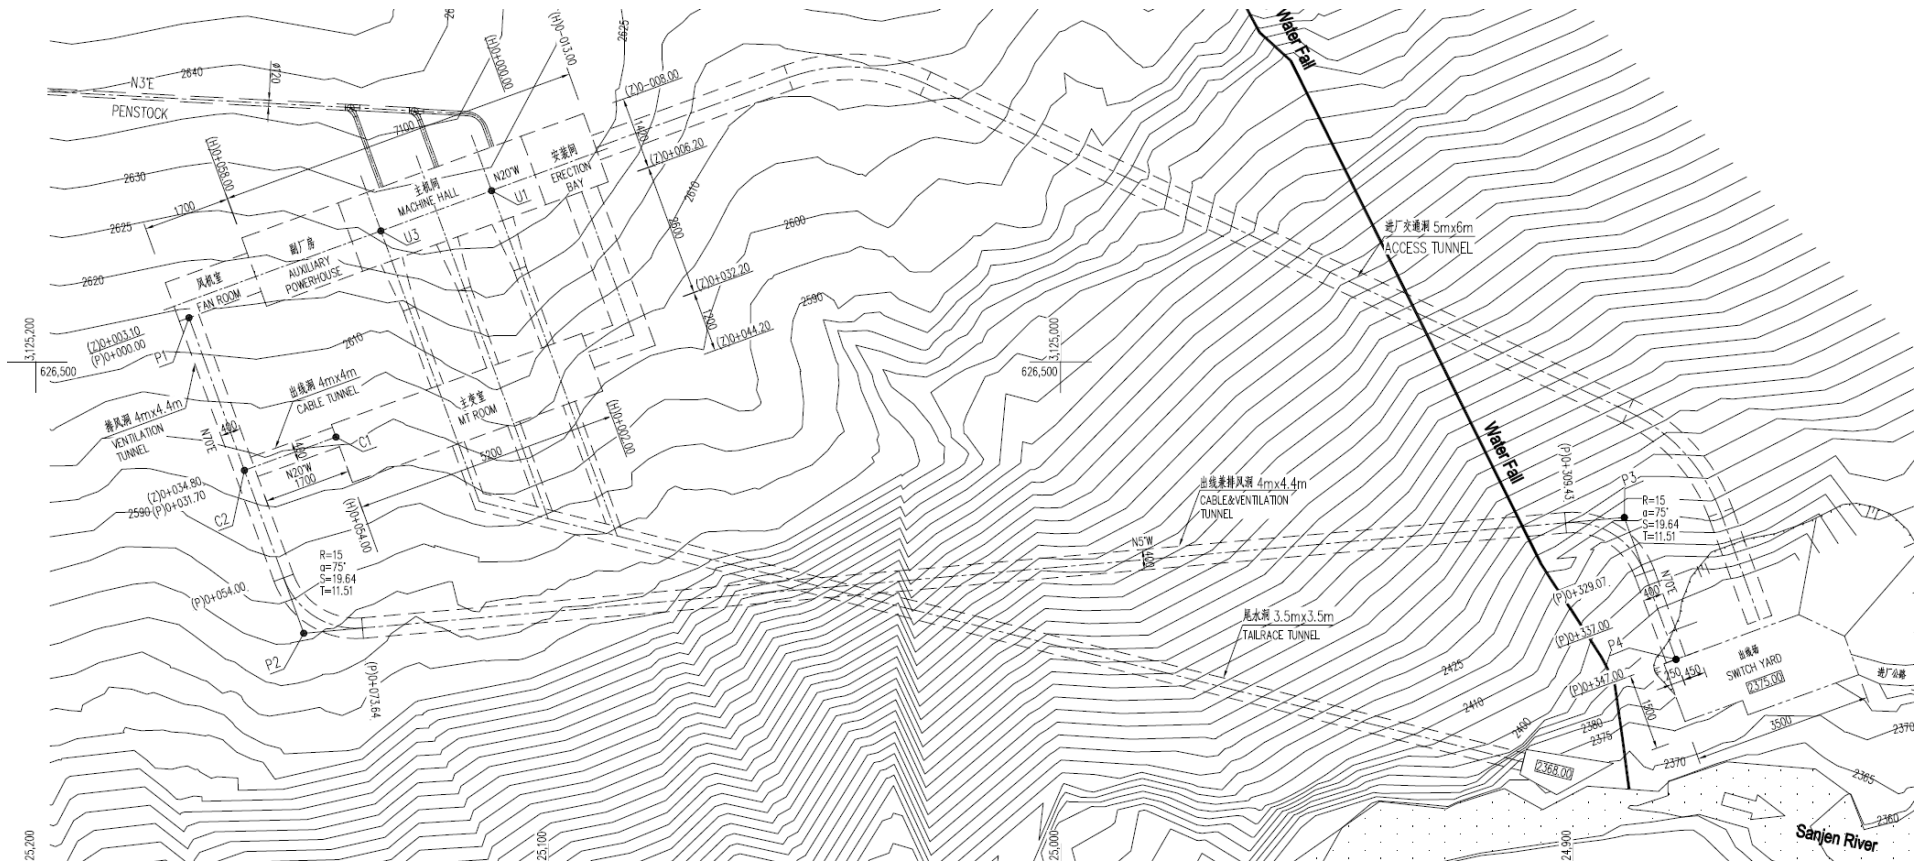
Powerhouse Plan (Source: Detail Design Report 2021)
